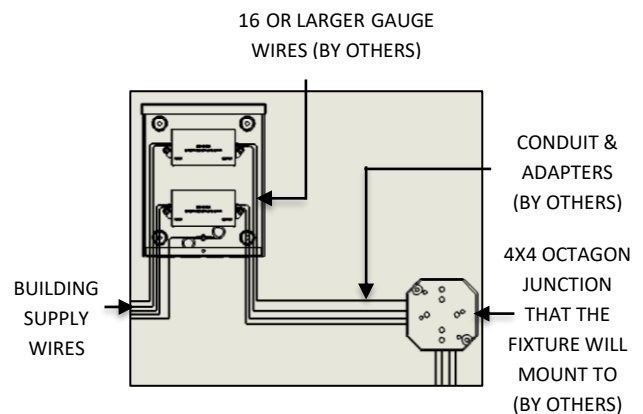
WIRE CONNECTION FROM BUILDING SUPPLY TO J-BOX FOR 72 MODEL
